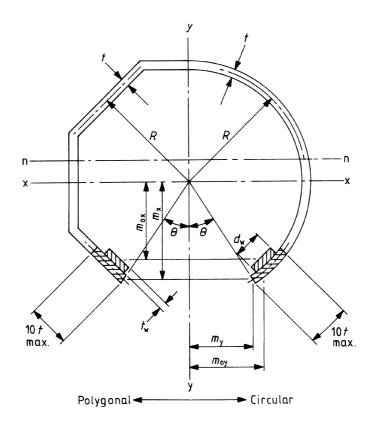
Cross sections of reinforced door openings in metal lighting columns
